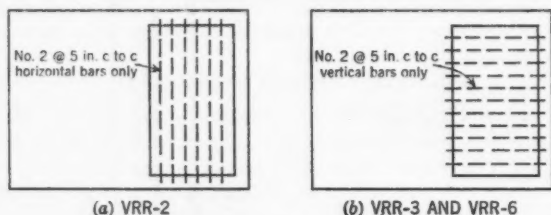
DETAILS OF VRR-SERIES WALLS
